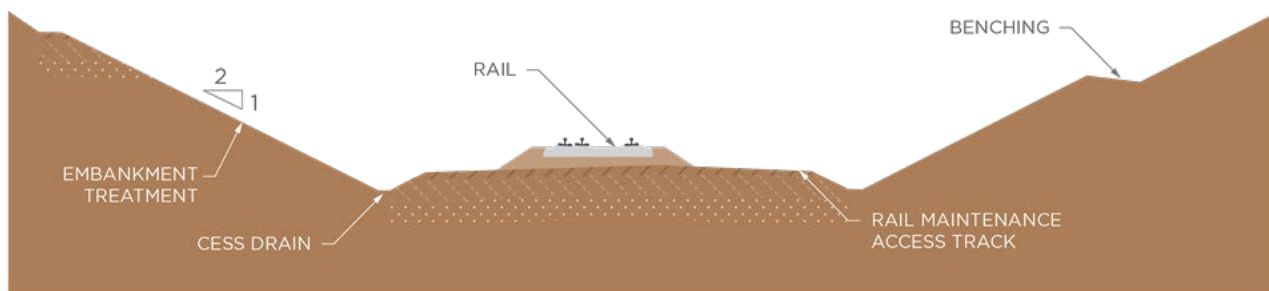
TYPICAL SECTIONAL DIAGRAM OF RAIL FORMATION SHOWING RAIL MAINTENANCE ACCESS ROAD
